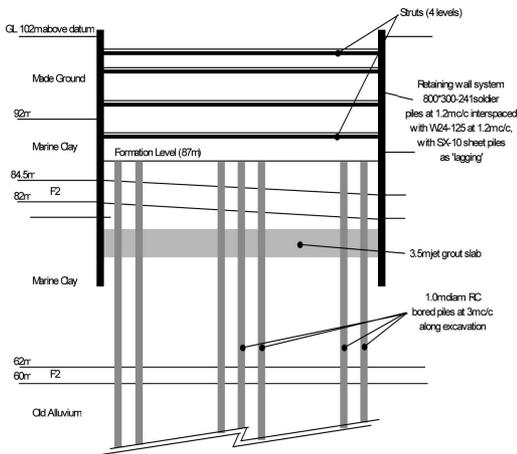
An example of a 'floating' wall system, used for part of the KPE construction.
